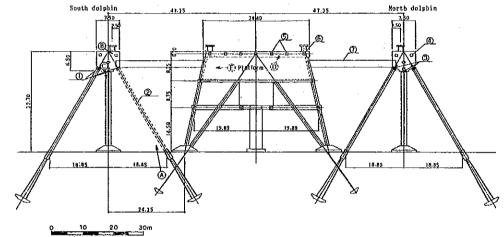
Visual Inspection Spots at Berth No. 12
